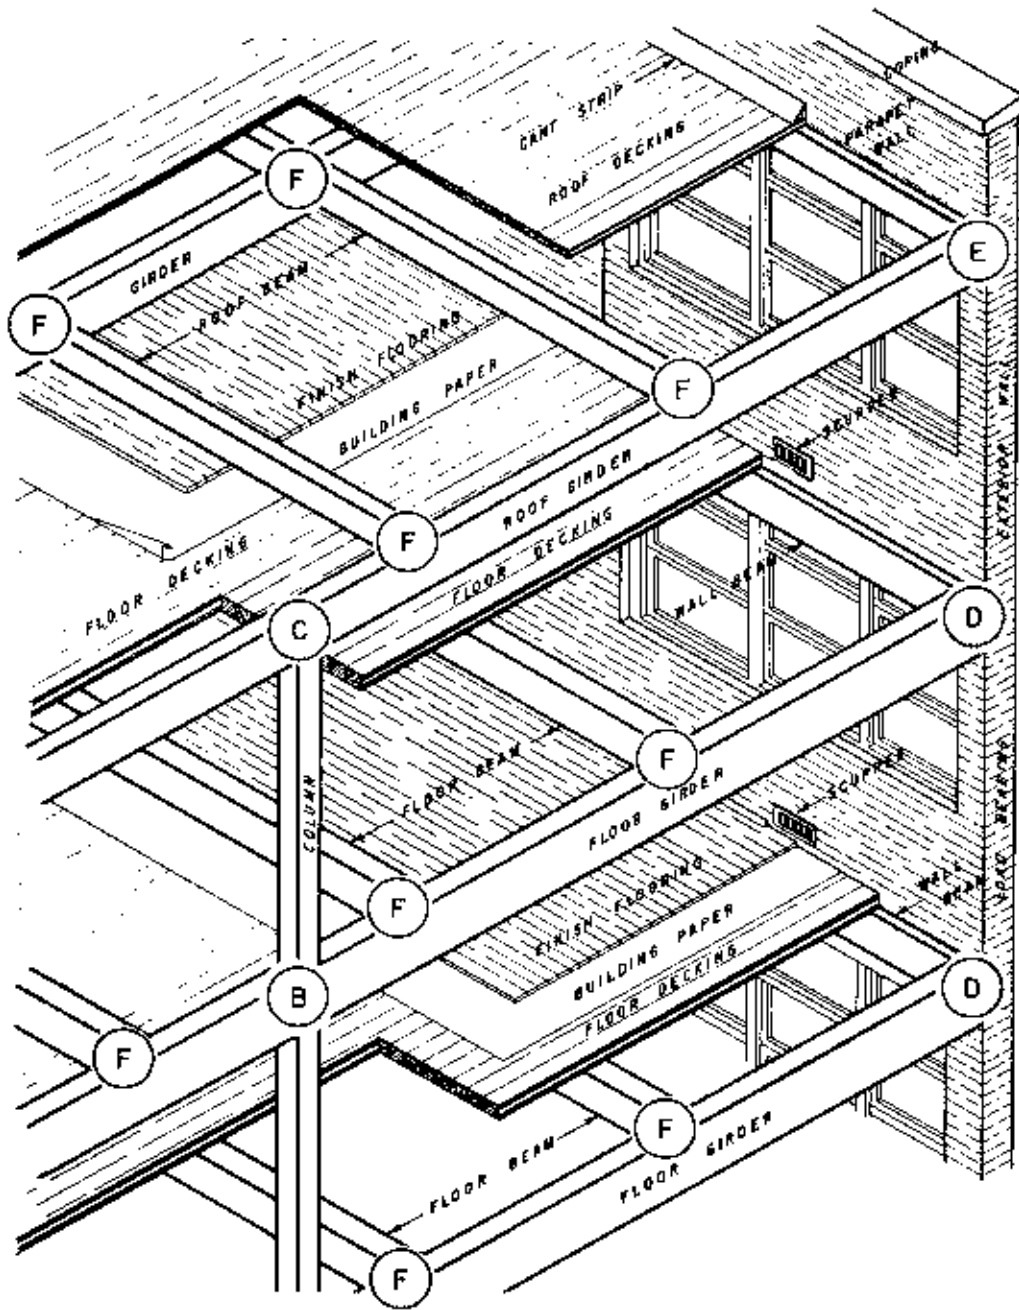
Traditional heavy timber construction. (Courtesy of American Forest and Paper Association)
